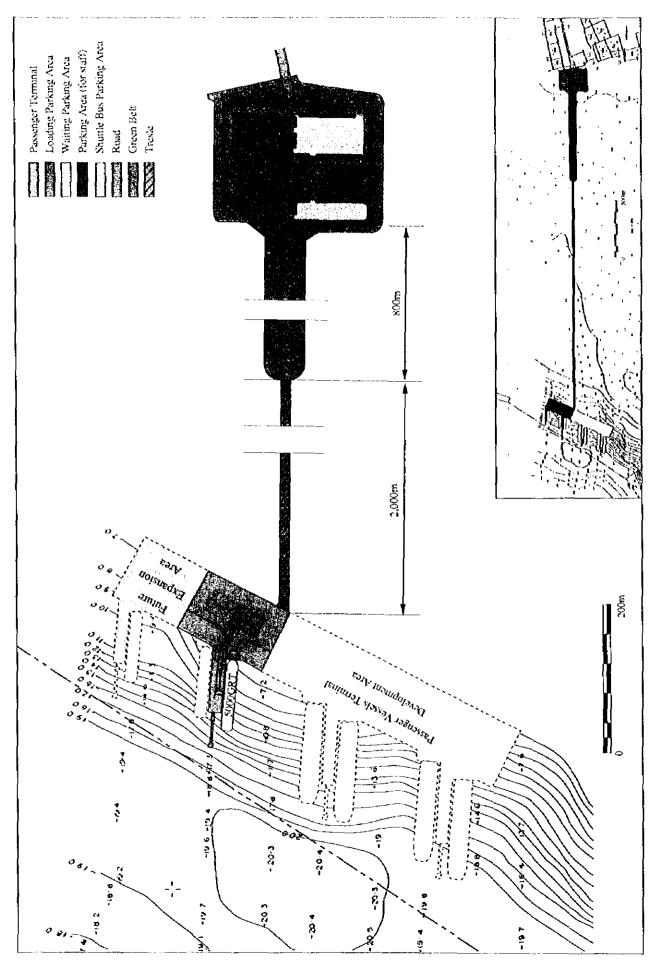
Layout Plan of Surabaya Ferry Terminal
